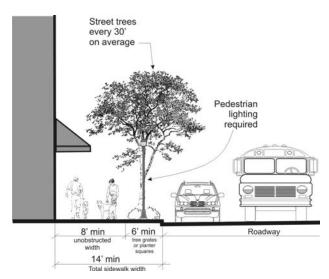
(C)(2)(a). Storefront Street sidewalk/planting strip standards.
